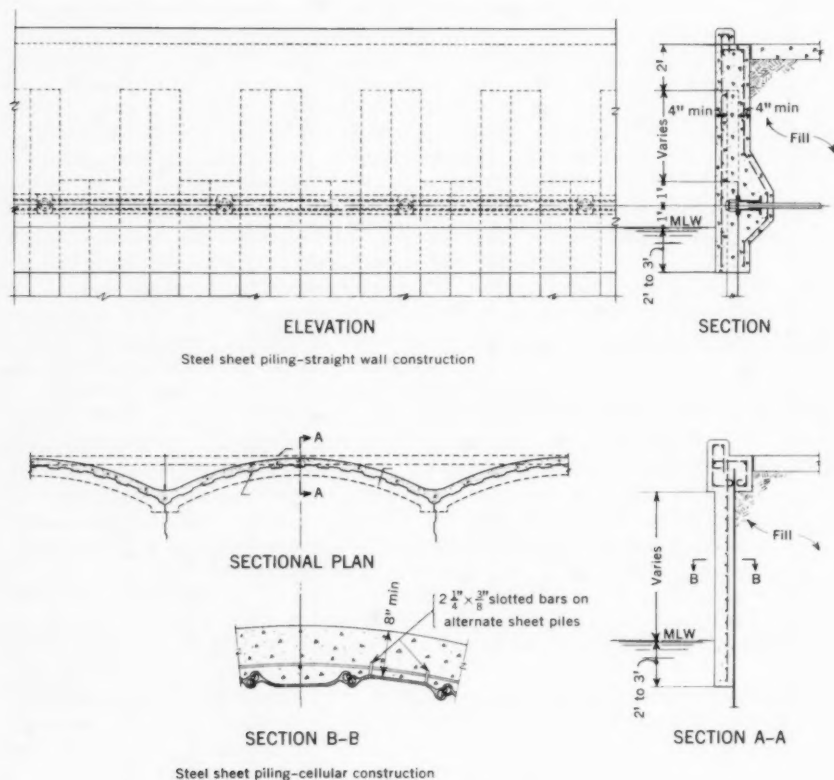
CONCRETE JACKETS FOR STEEL SHEET PILING
